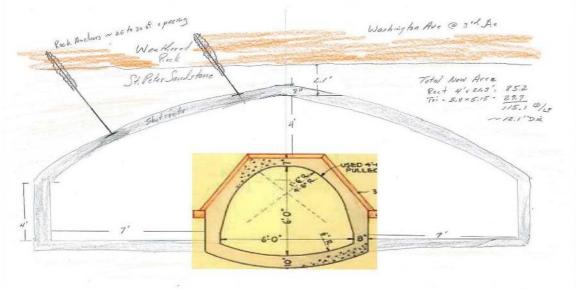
Tunnel Liner Anchor Spacing (Typical)
